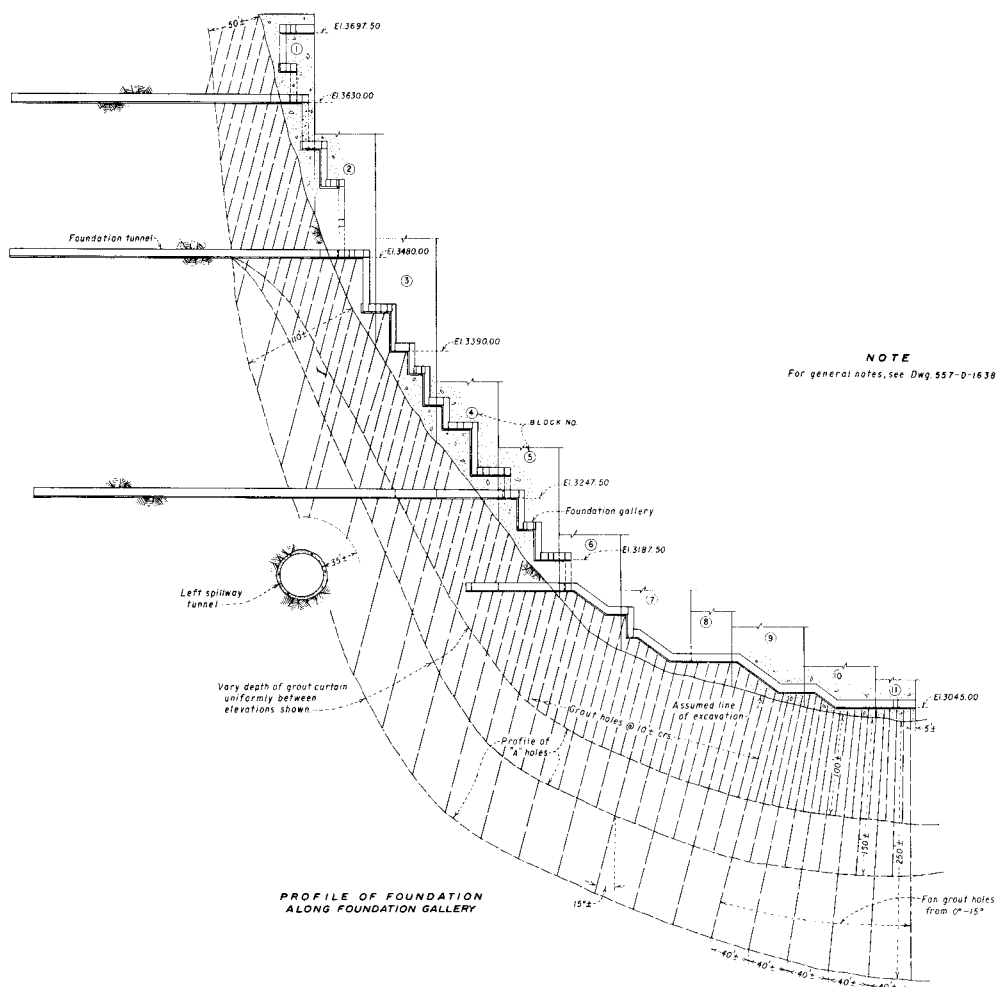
Dam foundation grouting—A-holes.(Sheet 1 of 2.) From drawing No. 557-D-1637.
